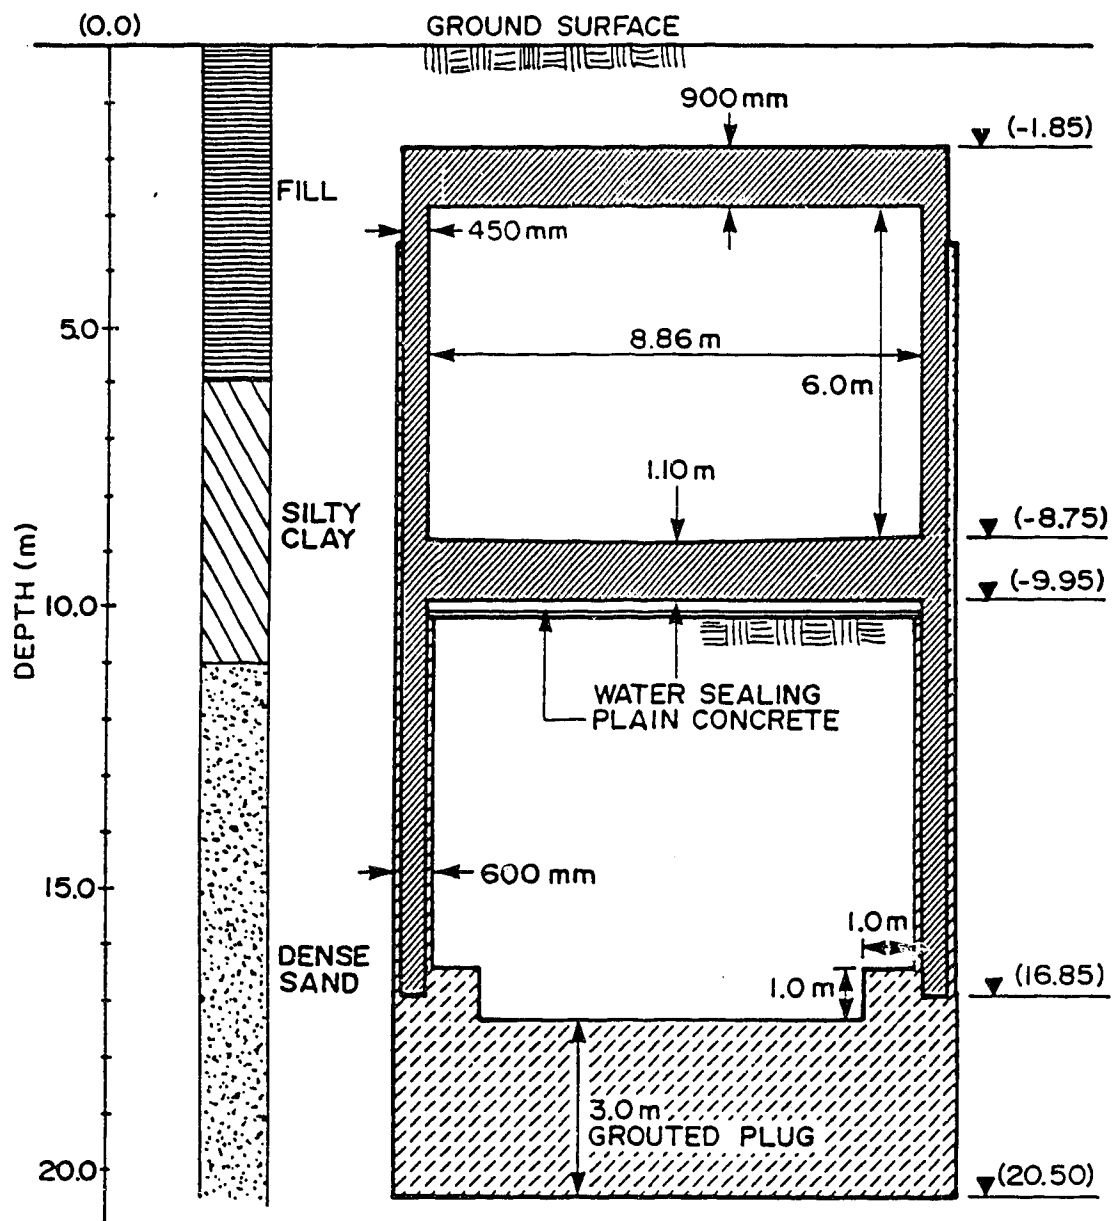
Cross-Section Details of the Tunnel Section and the Soil Profile at this Location
